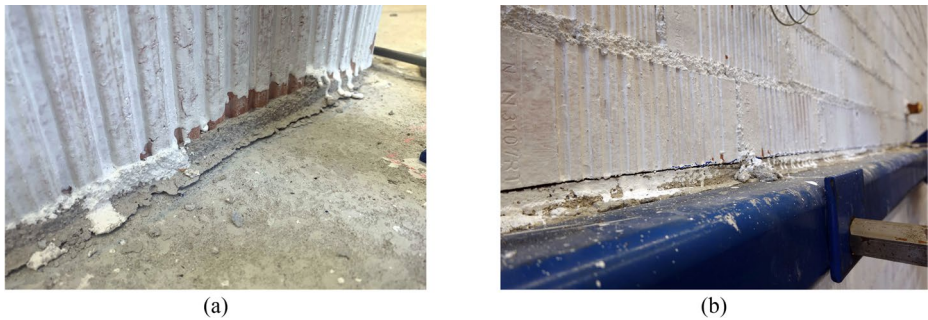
Uplift deformations observed at the boundary of the: (a) Southwest corner on the first floor, (b) South wall on the second floor
